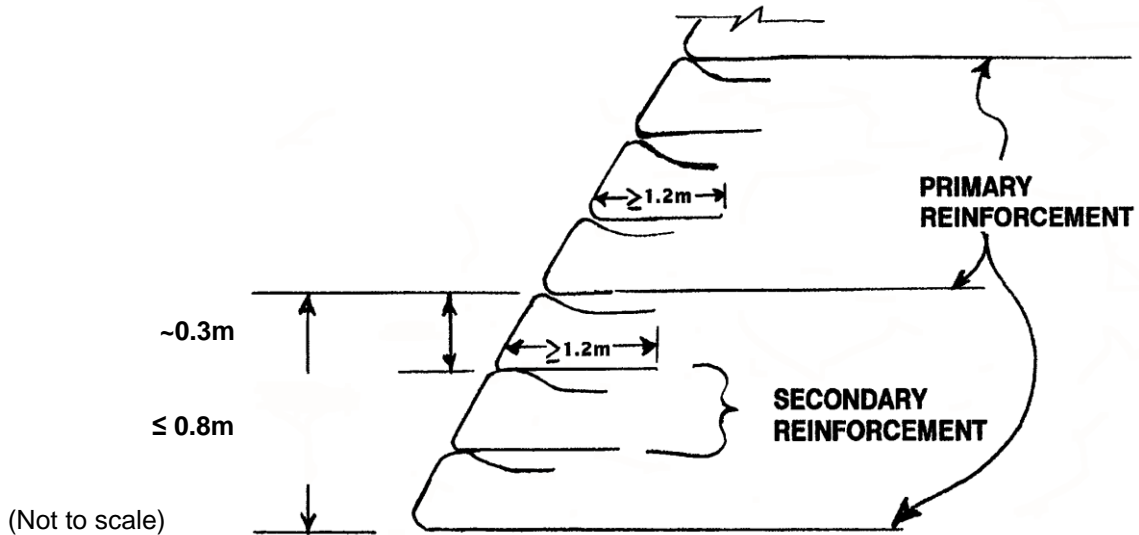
Typical geosynthetic reinforcement spacing layout for high RSS structures.
